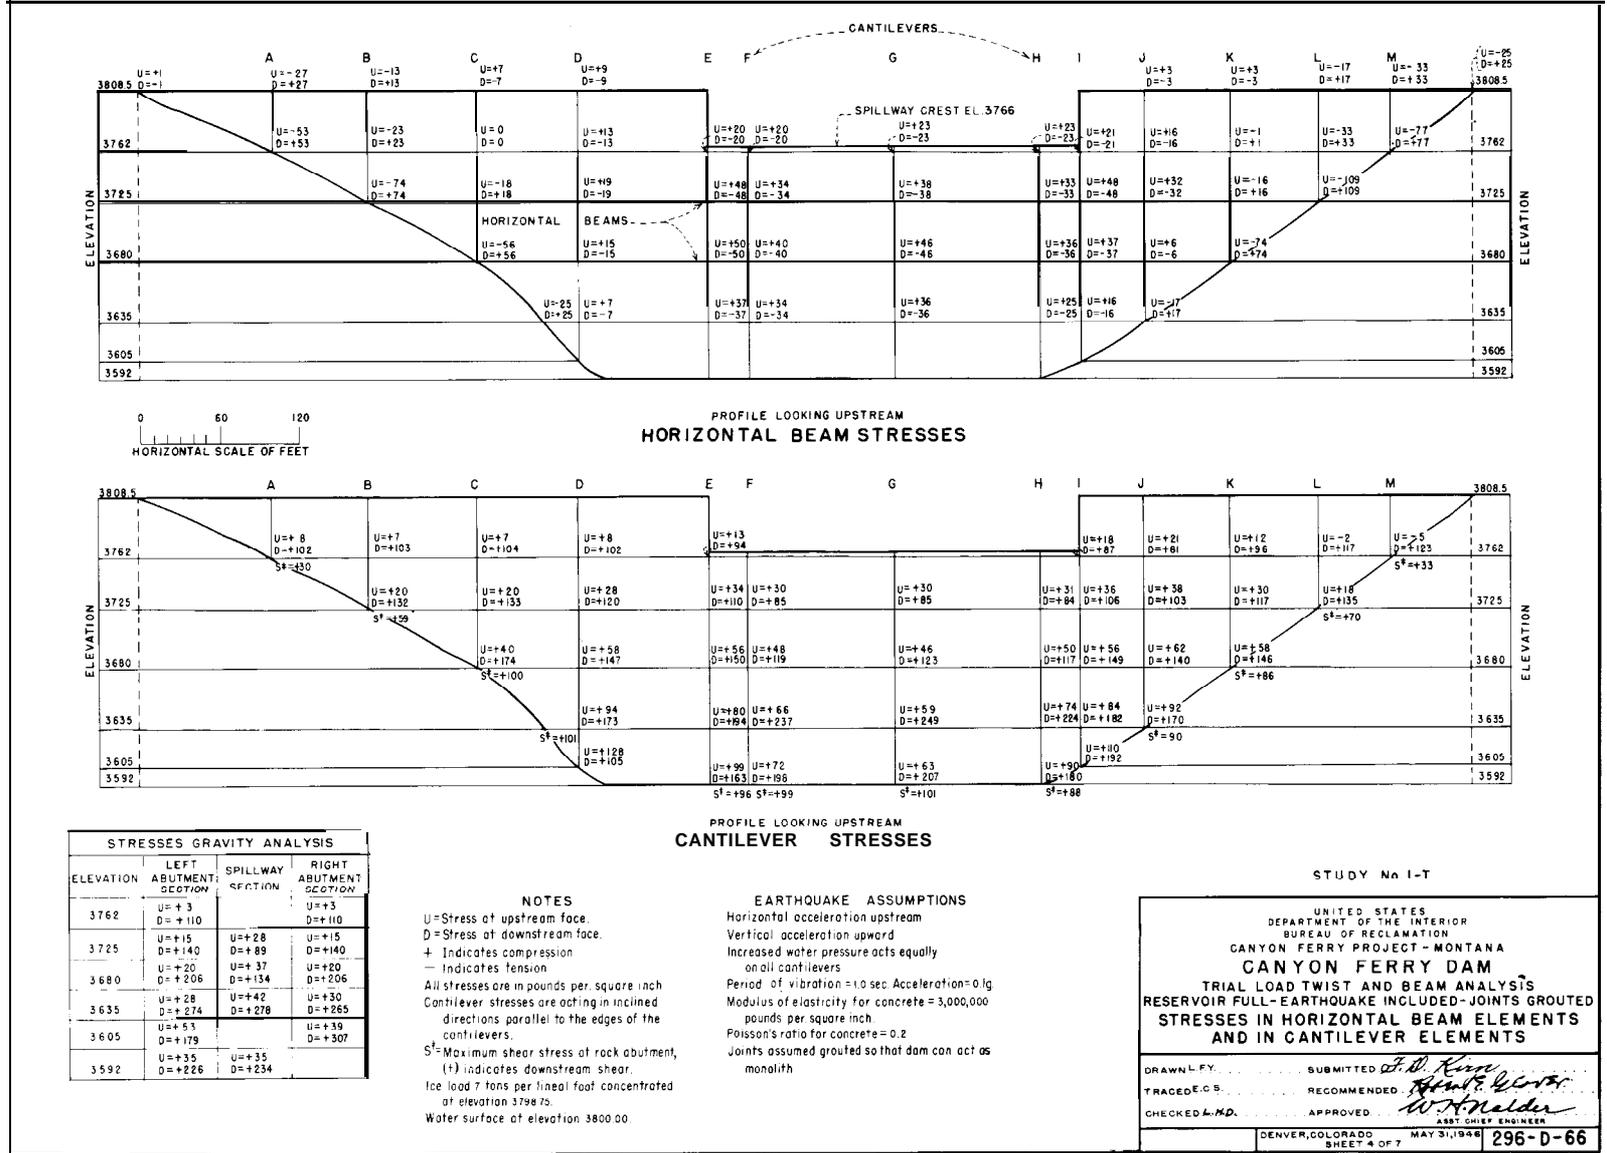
Canyon Ferry Dam study-stresses in horizontal beam elements and in cantilever elements.
